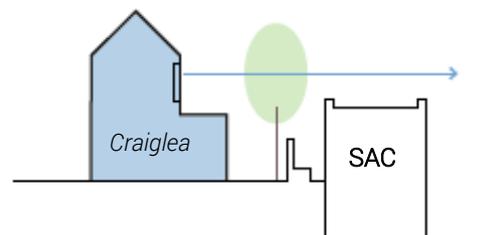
Existing views from Craiglea looking west to the Middle School (SAC).
